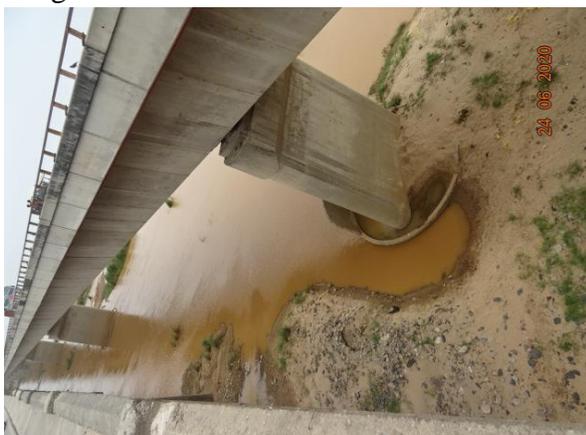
Photo of pot holes formed near Pillars of bridge over river Son
